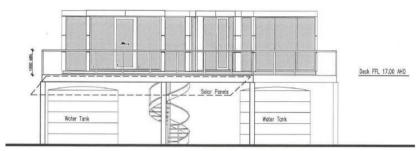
Proposed (amended) dwelling design. Source: Application documents
